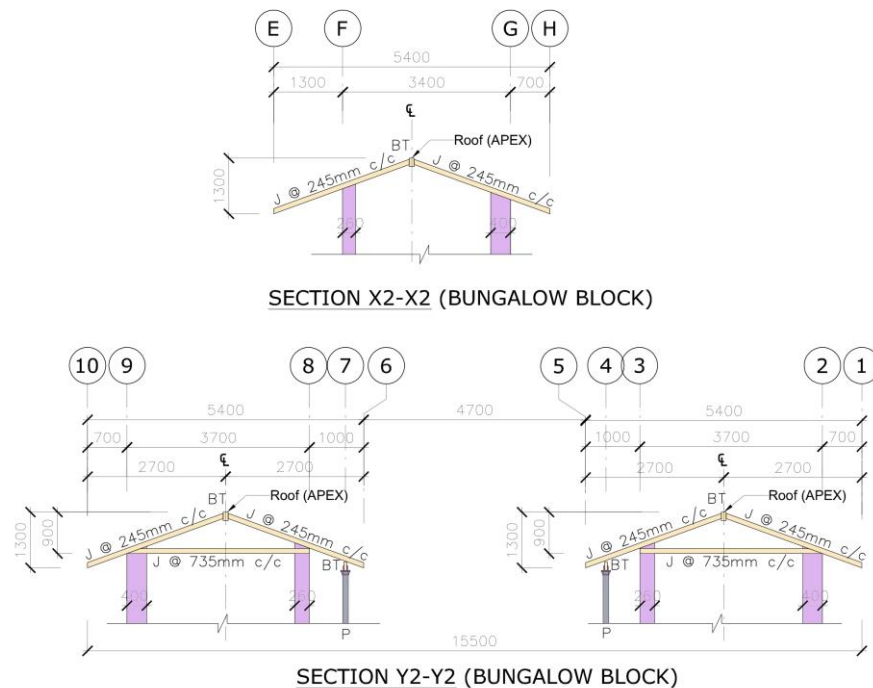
Sections of the roof trusses structure. For location, see the roof measured plan. The load bearing walls are coloured in purple. Edited by Hannah Liu.
